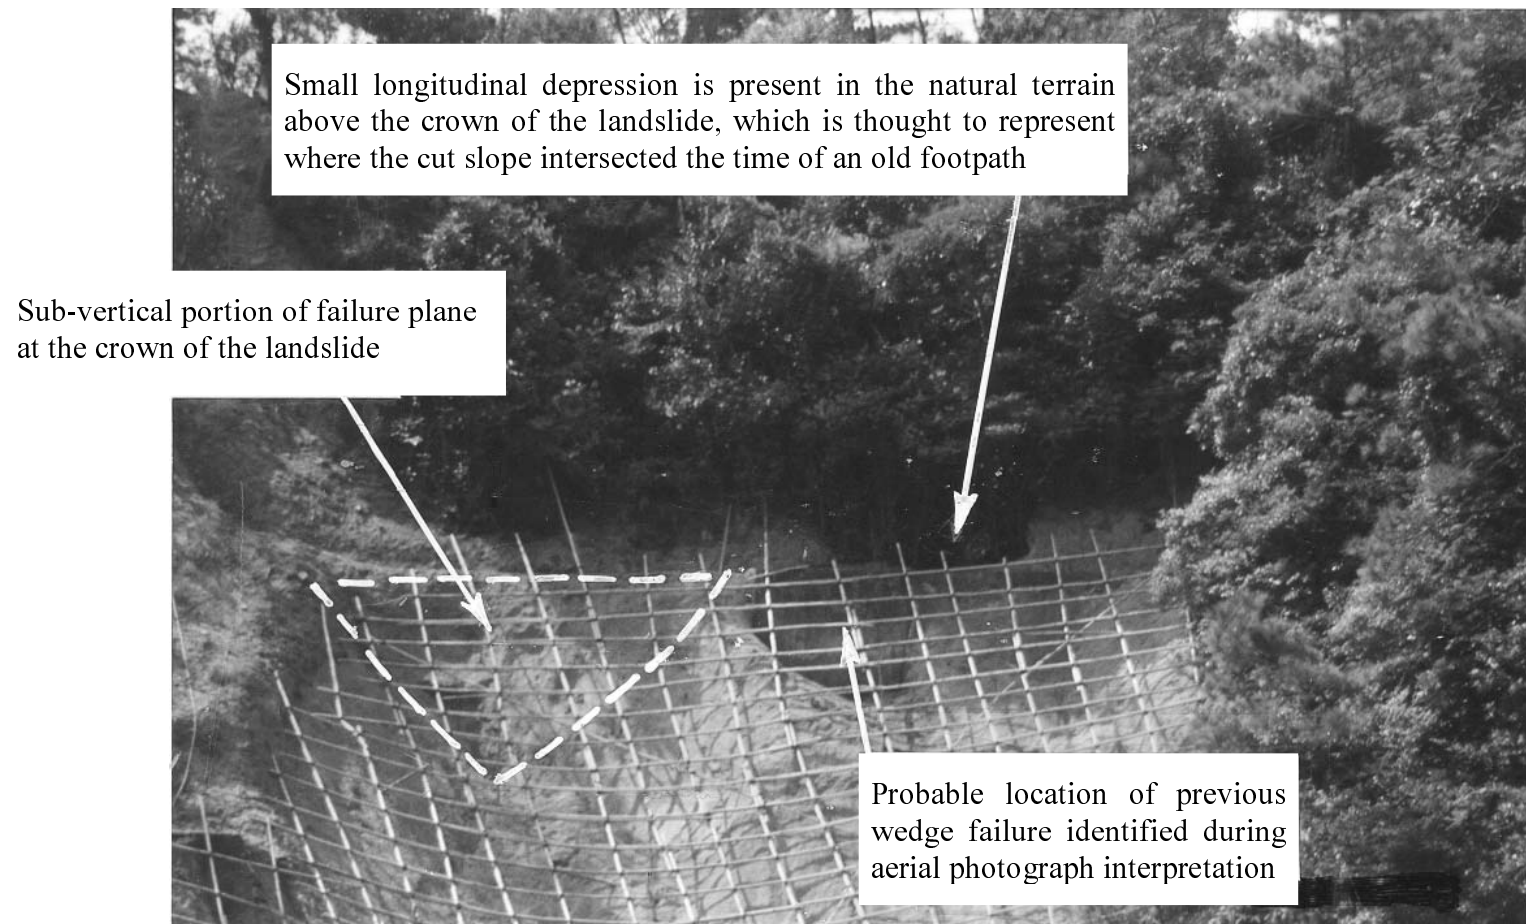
View of the Upper Portion of the Failure Following Clearance Works
